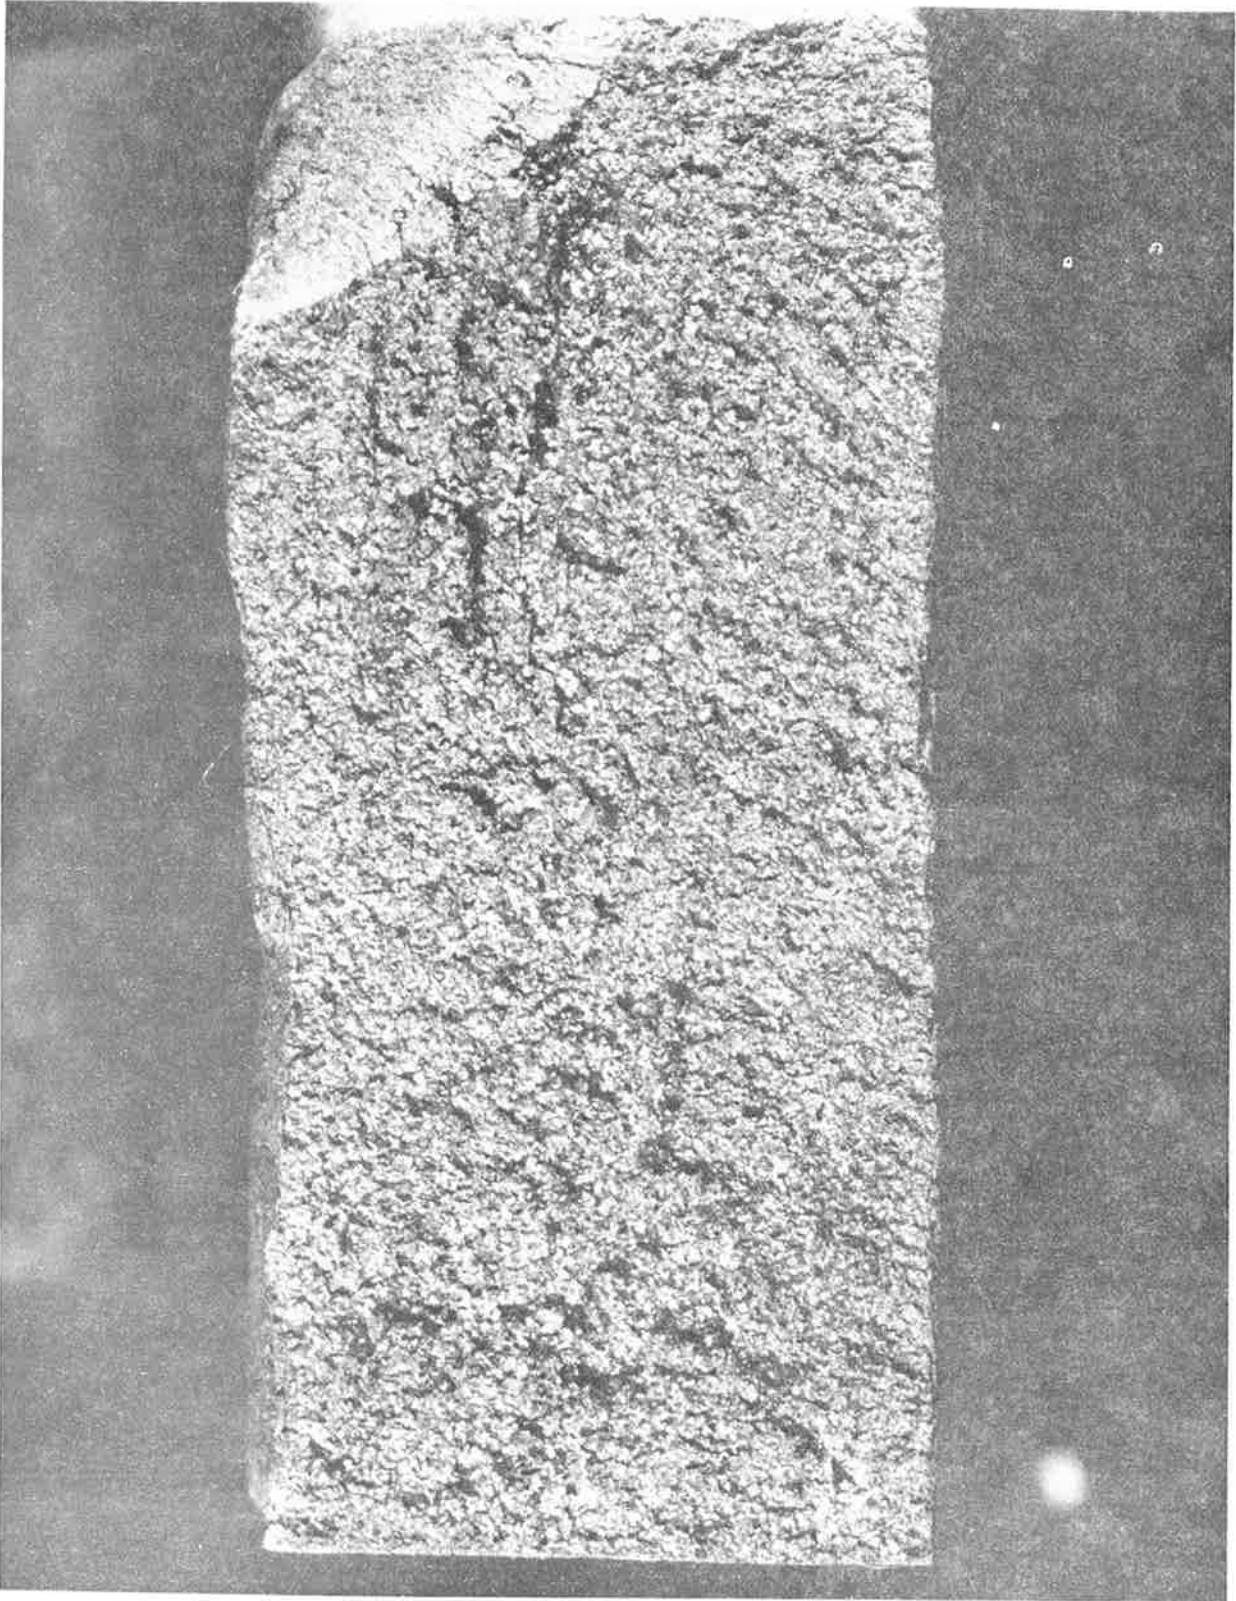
Preexisting 1/4-inch Crack—Milepost 107.64
